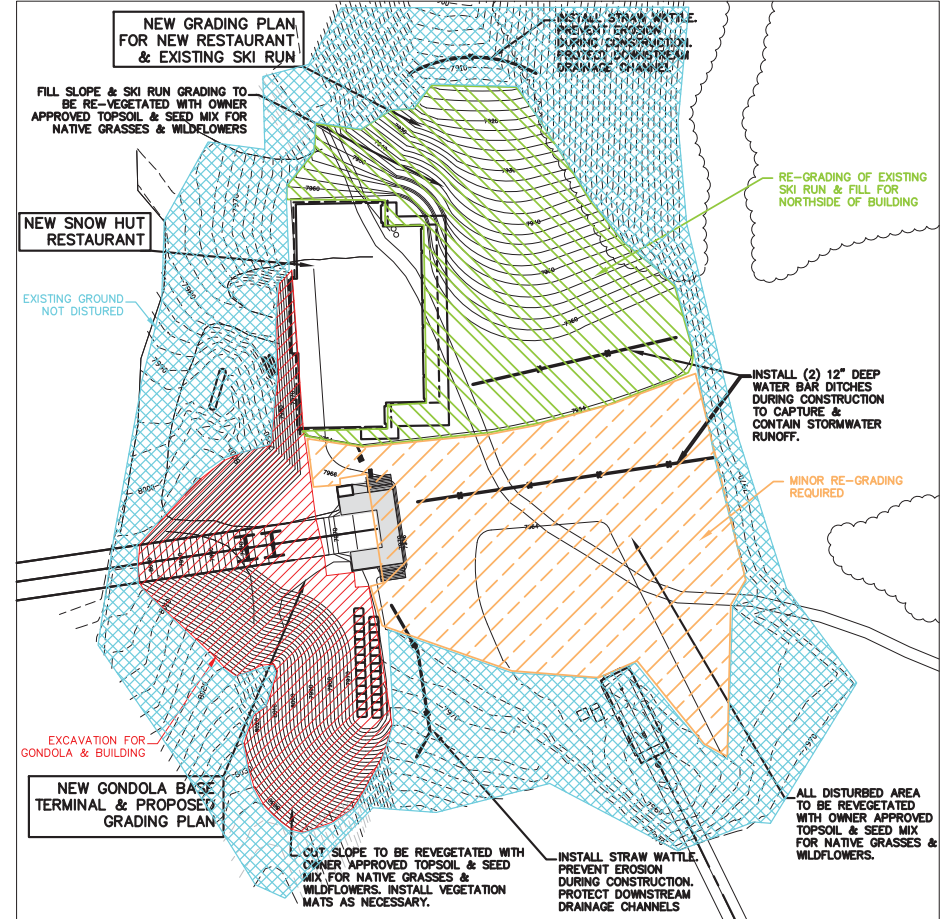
Exhibit F - New Gondola & Snow Hut Overall Site Plan
